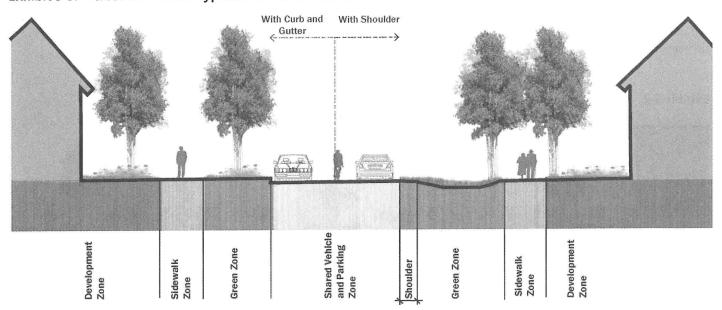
Cross section for typical local/subdivision office-commercial-industrial street.
